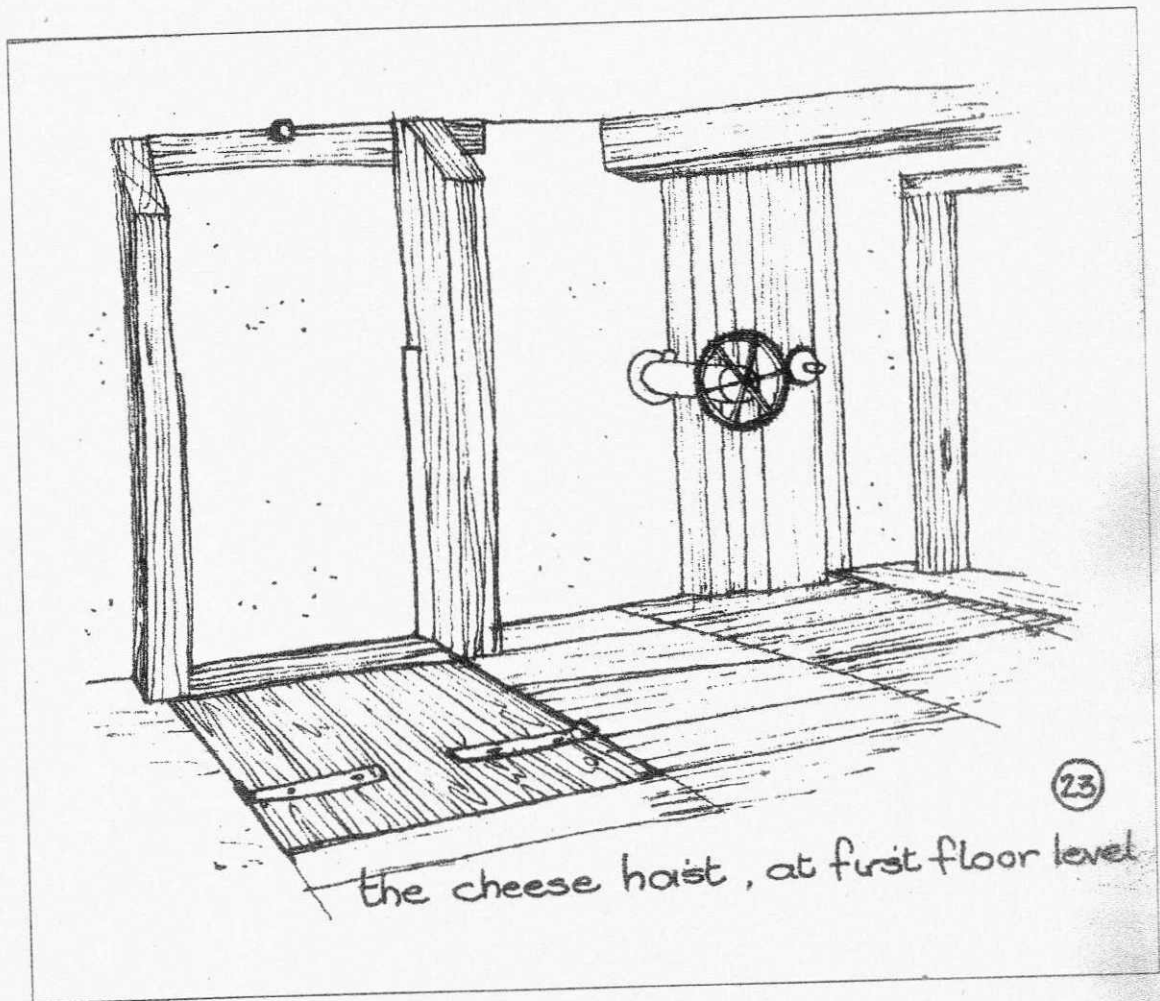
Sketch of cheese hoist on first floor, now removed; from report by architect Leach Rhodes and Walker, 1962
